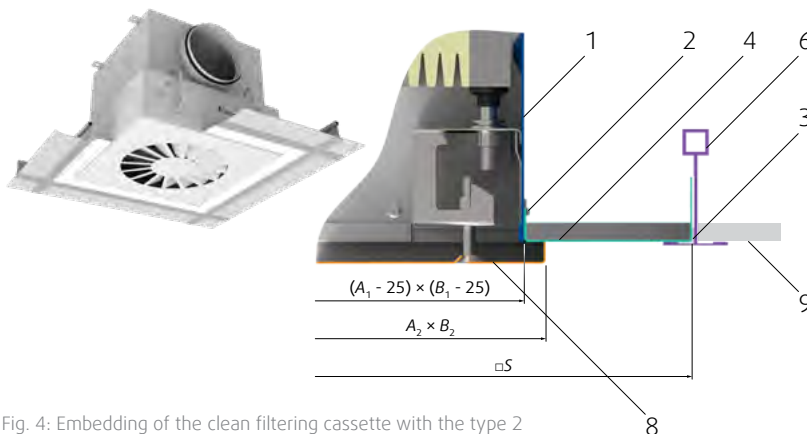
Embedding of the clean filtering cassette with the type 2 front panel fitting surface into a T-bar suspended ceiling
